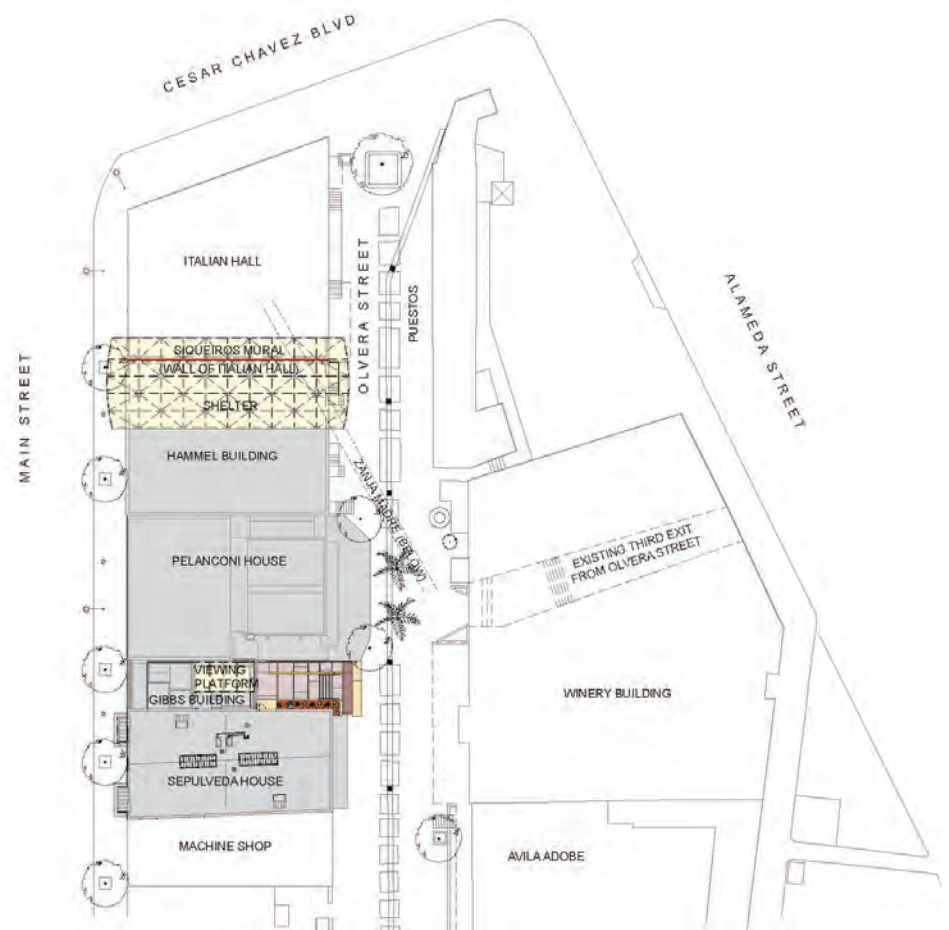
Plan of the project site, including the Sepulveda House, the Gibbs Building, the Pelanconi Warehouse, the Hammel Building, and the Italian Hall. Drawing © Brooks + Scarpa Architects, 2009.
